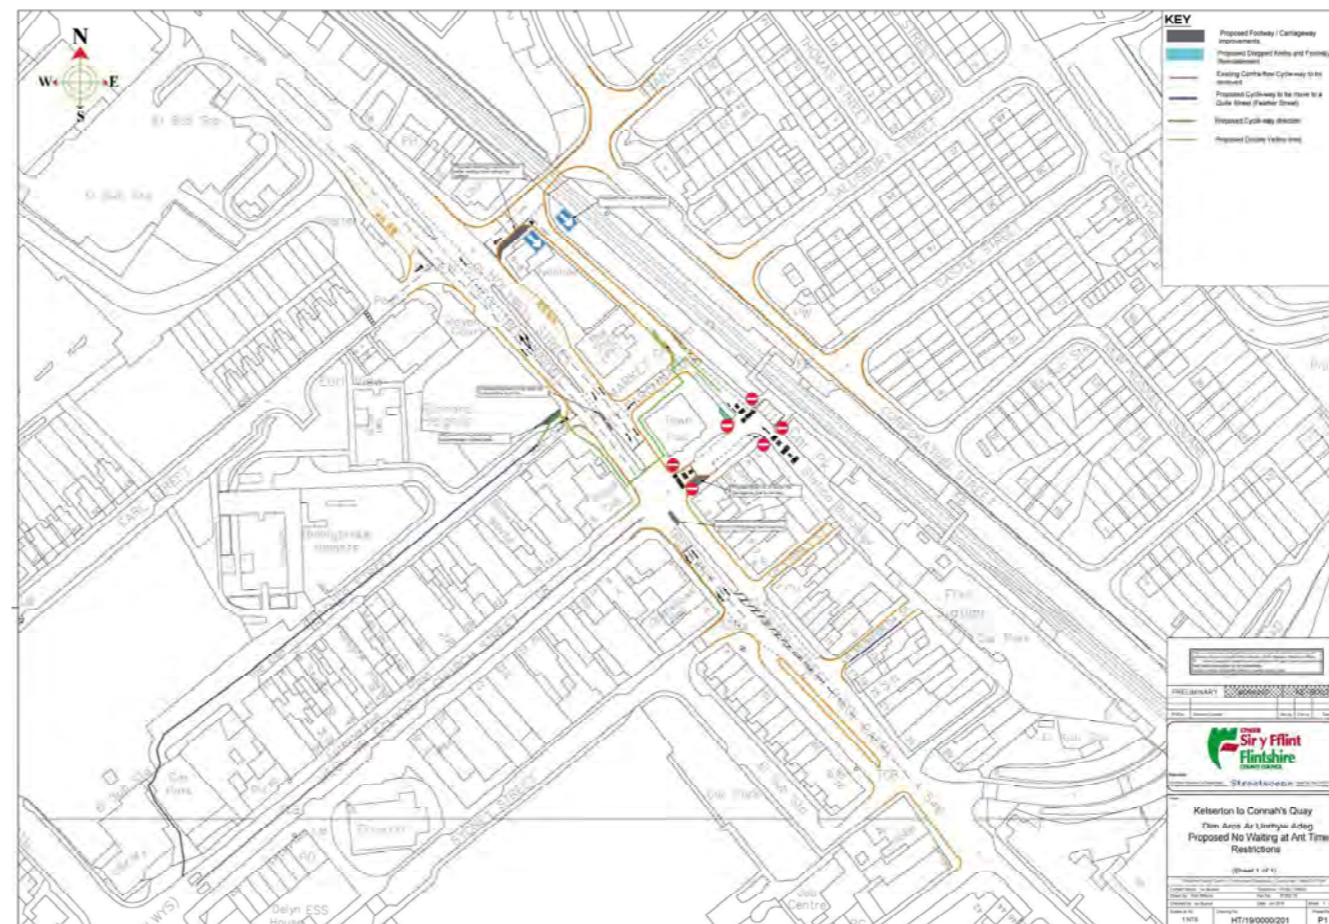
Outline plans for amendments to walking and cycling links between town centre and Foreshore
